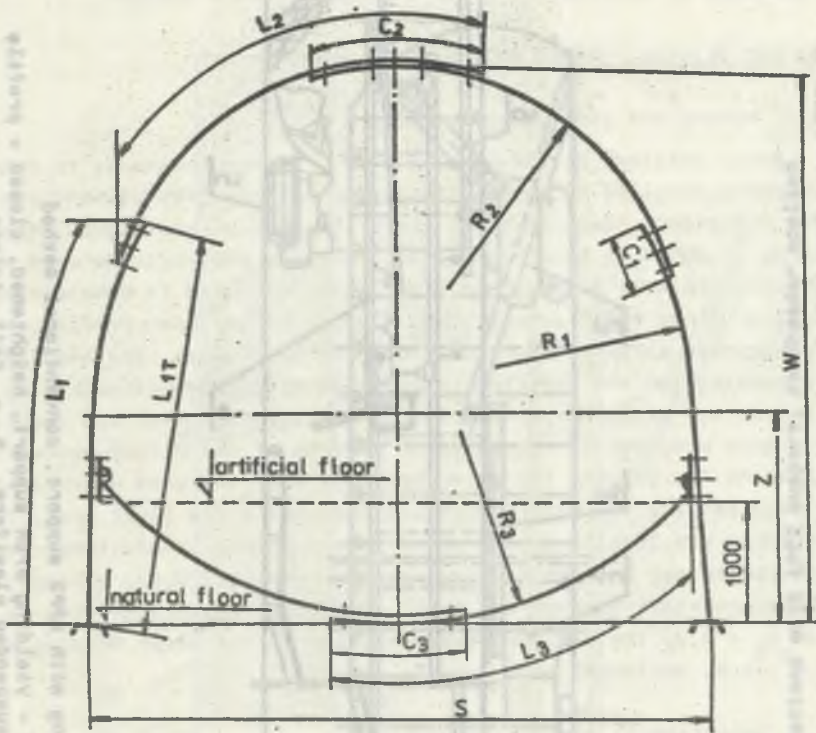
Construction and overall dimensions of ŁPPZ-V44-4P arch support
